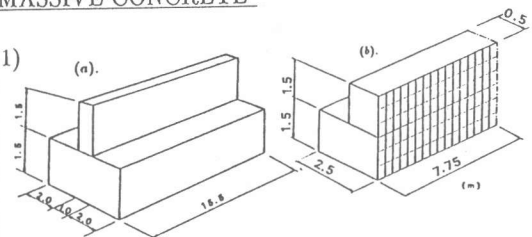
(a). A block of fresh concrete casted on hardened concrete block. (b). Two-dimensional Finite Element Mesh.
